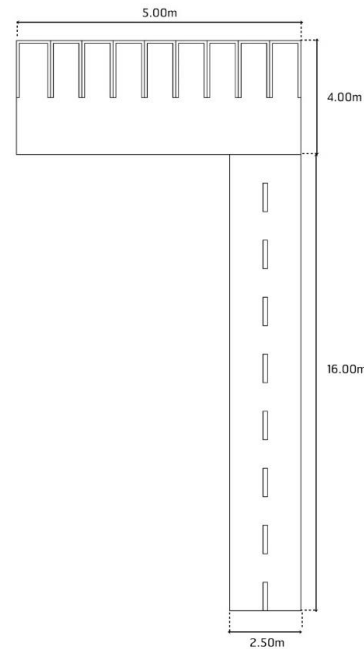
Layout in above view shows traffic route and vehicle parking area.
